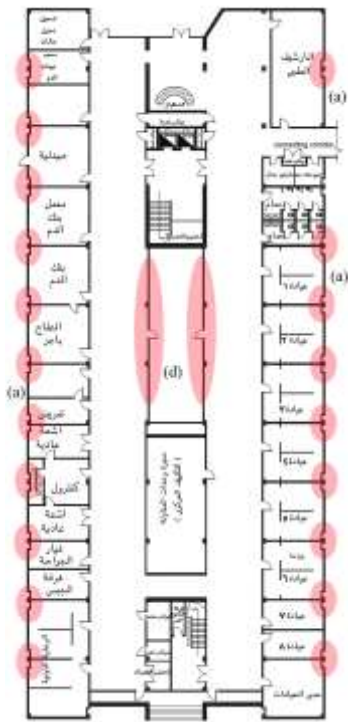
Proposal to improve natural lighting and ventilation in the secondary building.
